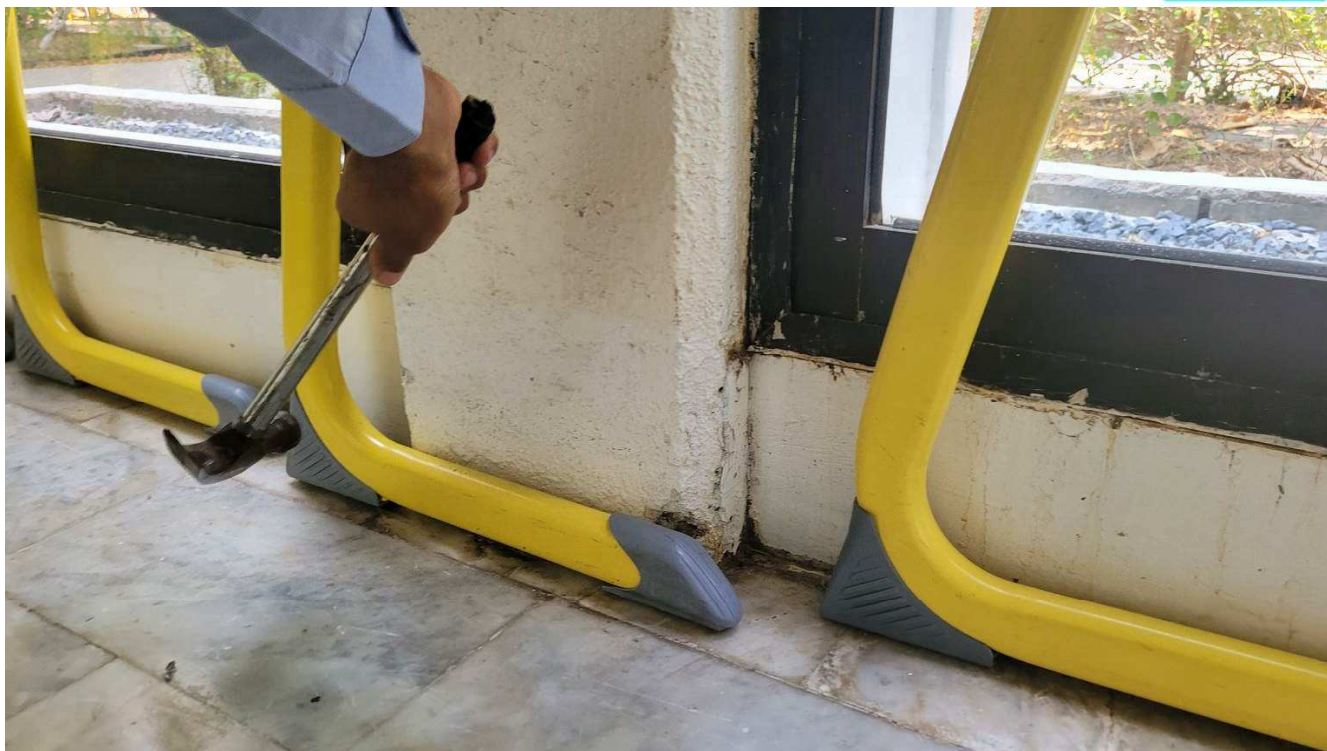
Hollow sound during hammer testing which indicates defective concrete
